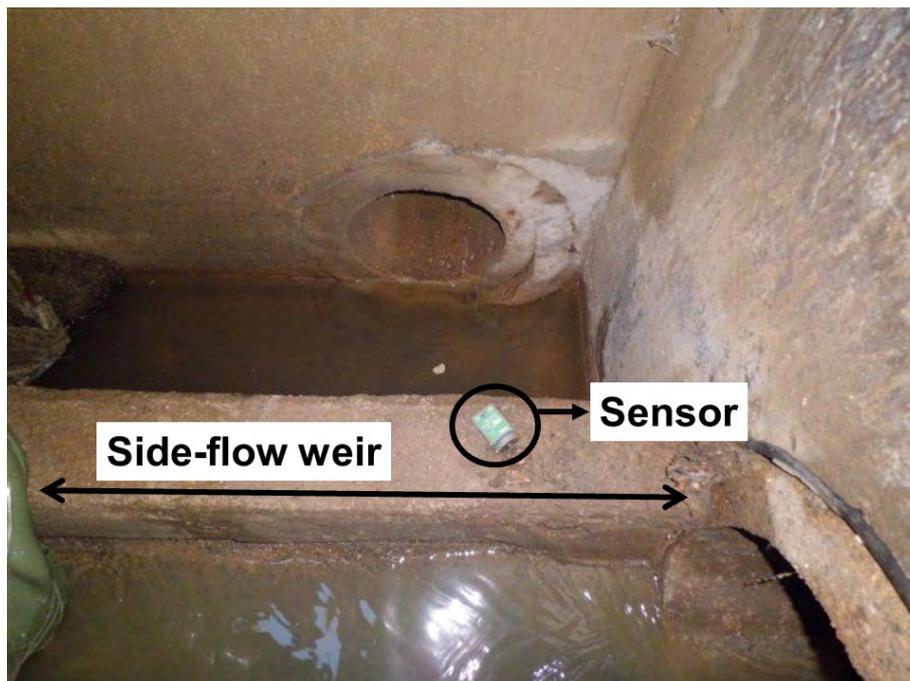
Detail of the sensor installation on the crest of a side weir.
